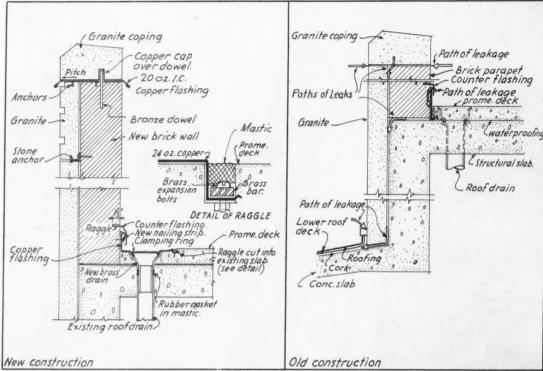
Old and new construction at point 4 (See Fig. 3). Water entered through separation of cap and base flashing and passed down between veneer and backup; crossed the lower deck and entered the building as shown by the arrows. New construction used through wall flashing under copings and a better flashing application to seal out the water. A photograph of the new drain is shown in Fig. 7.
